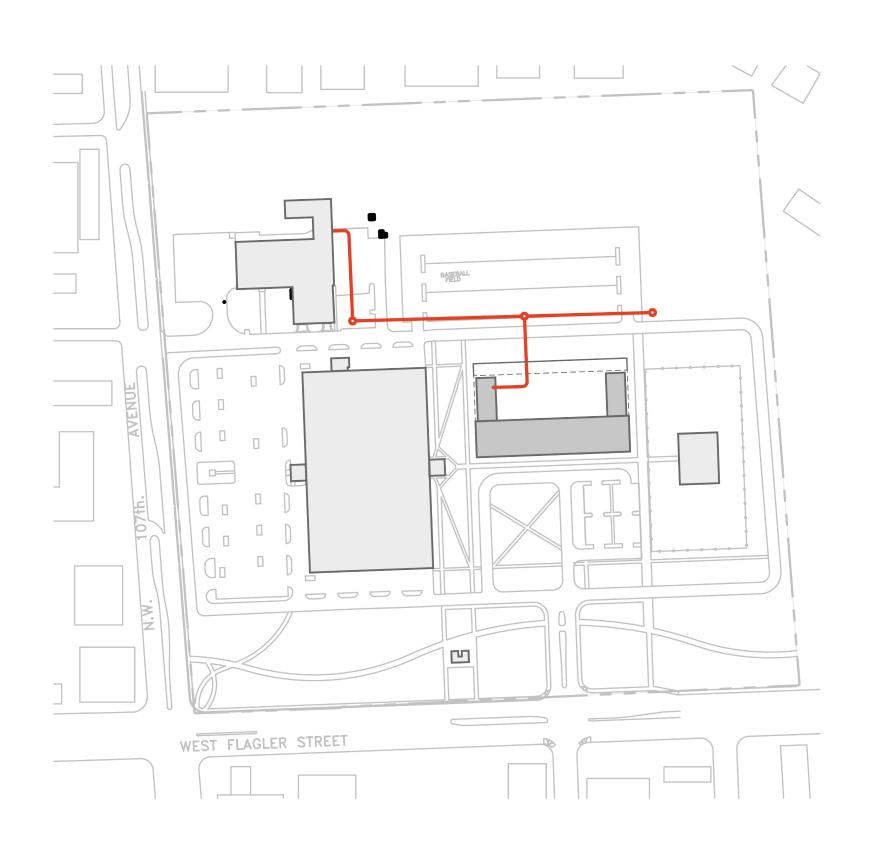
ENGINEERING CAMPUS 2015 CHILLED WATER INFRASTRUCTURE PLAN
